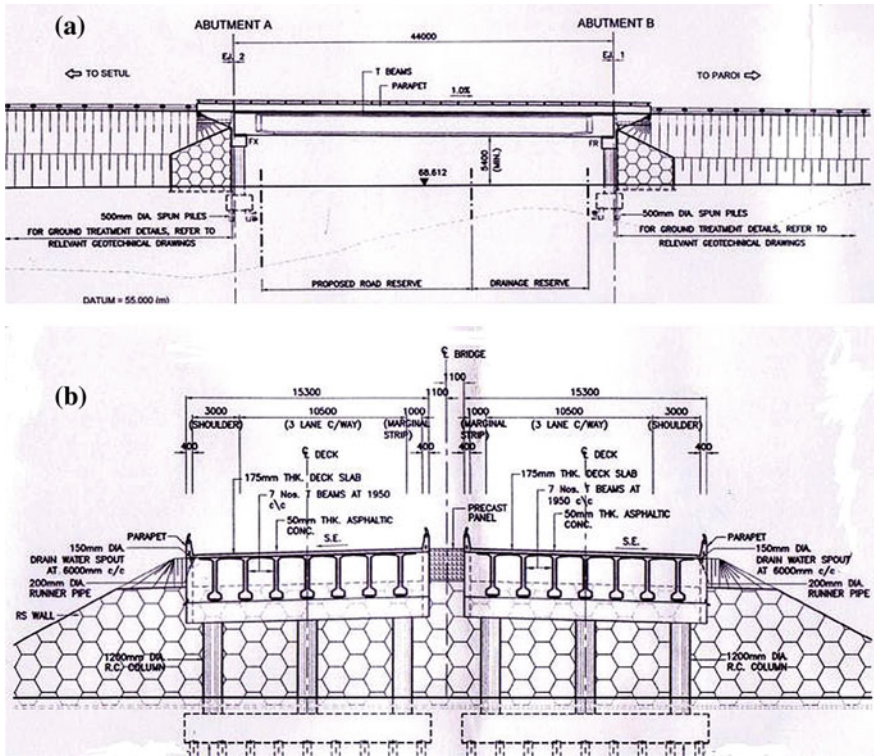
The details of the bridge structural elements. a Elevation view. b Section view
